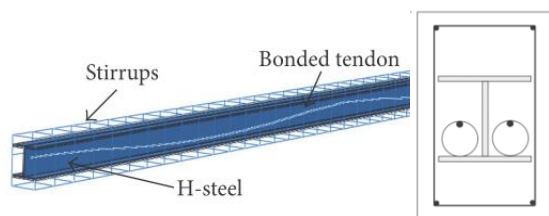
Prestressed steel-reinforced concrete beams [11]
